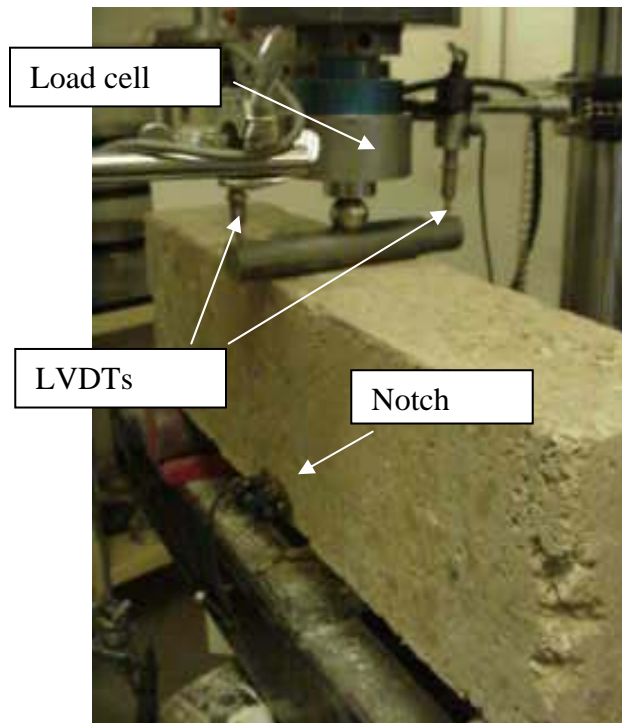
Photographic view of a notched beam specimen prior to testing for G_f
